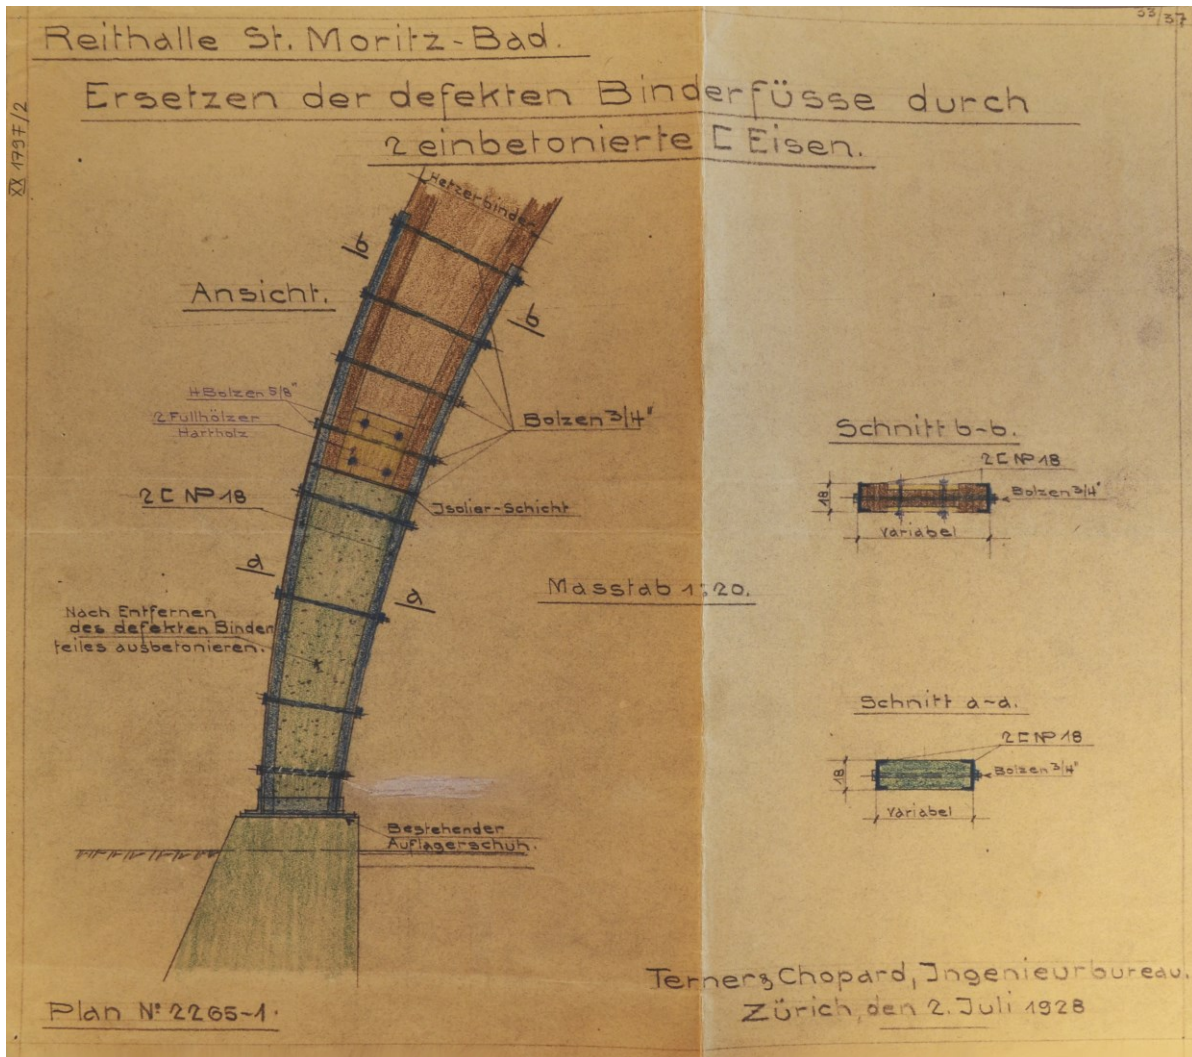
Riding arena, St. Moritz. Engineers, B. Terner and Ch. Chopard, 1911. Base of girders, replacement of decayed sections by concrete components straddled by iron U-profiles in 1928
